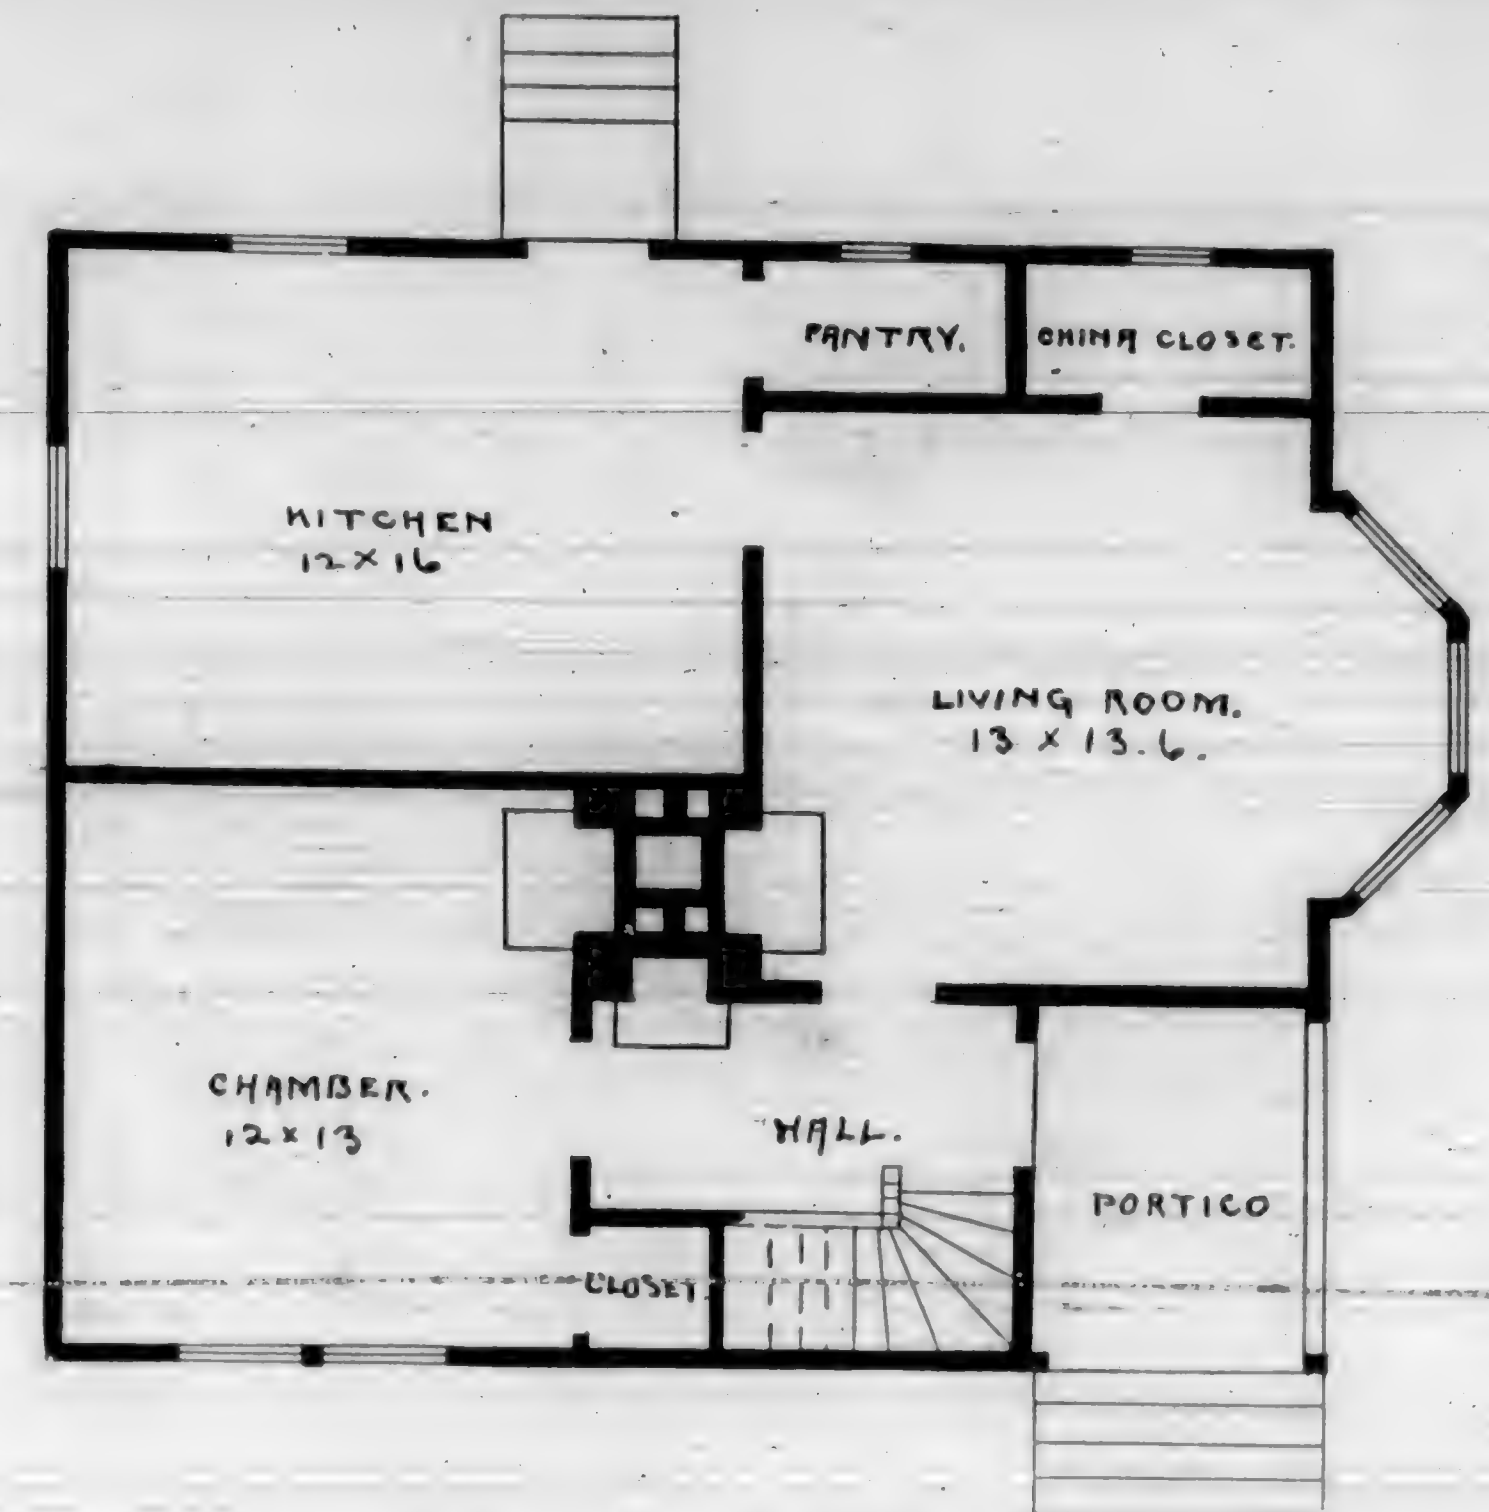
A COUNTRY COTTAGE. FIRST FLOOR PLAN.
